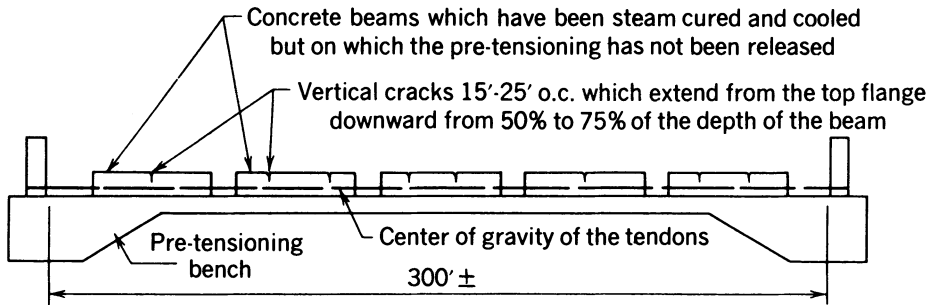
Cracking in pretensioned beams due to shrinkage and temperature deformations aggravated by heat curing.
